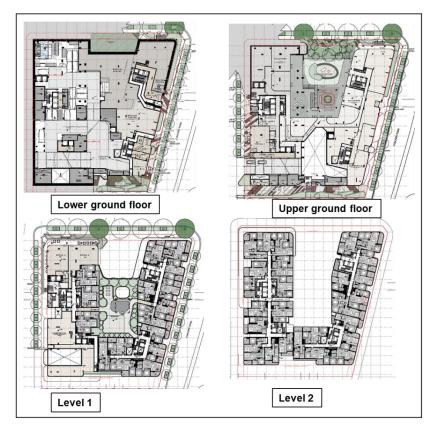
| Proposed Floor Plans (Source: Applicant's Architectural Plans, Rev F dated 27/05/2024)
